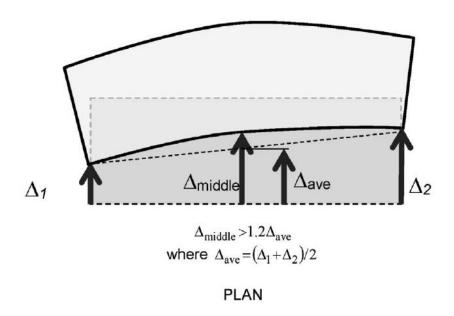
Definition of Flexible Floor Diaphragm [Courtesy: IS 1893 (Part-1): 2016]
